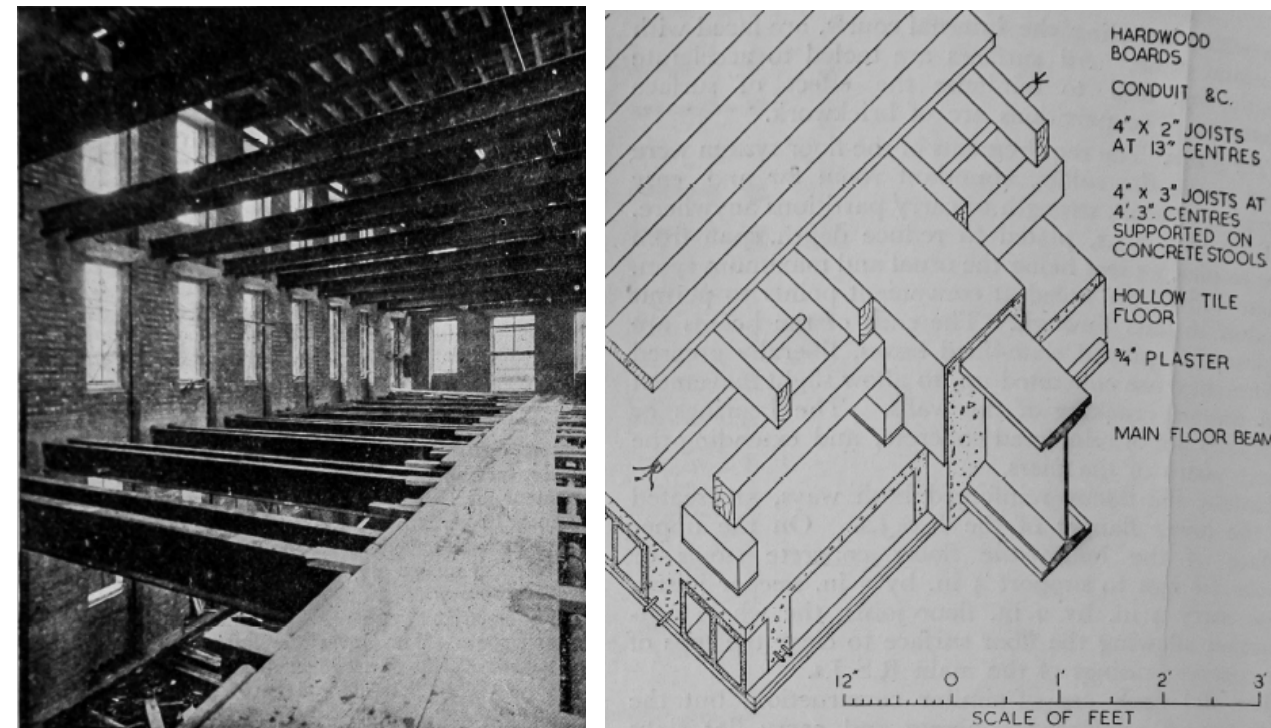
A picture (left) and a drawing (right) showing the design of the floor construction. Source: RIBA Journal.
